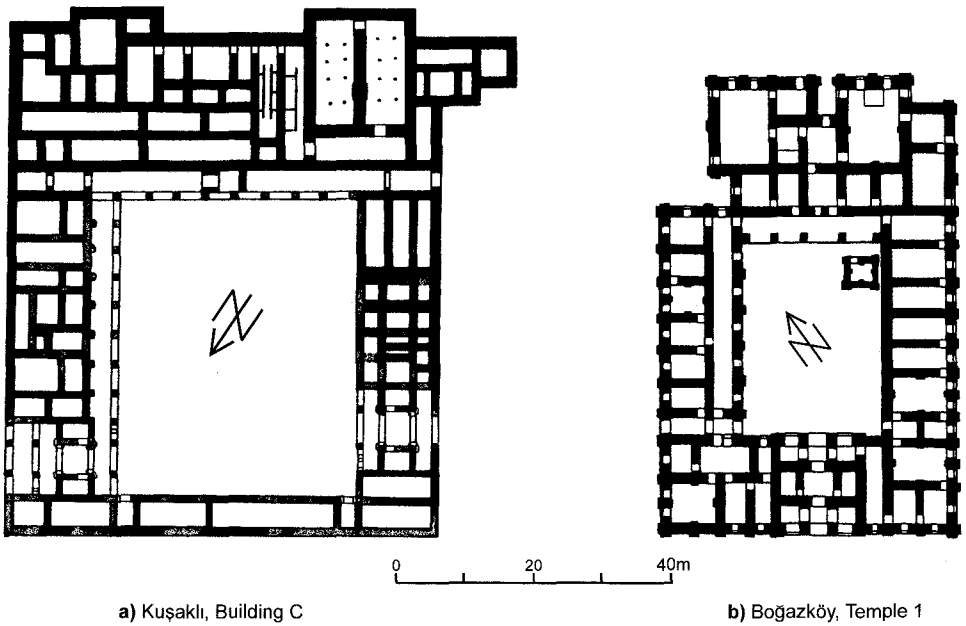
Plan of Building C in Kuşaklı (a) and Plan of the Great Temple of Ḫattuša (b).
